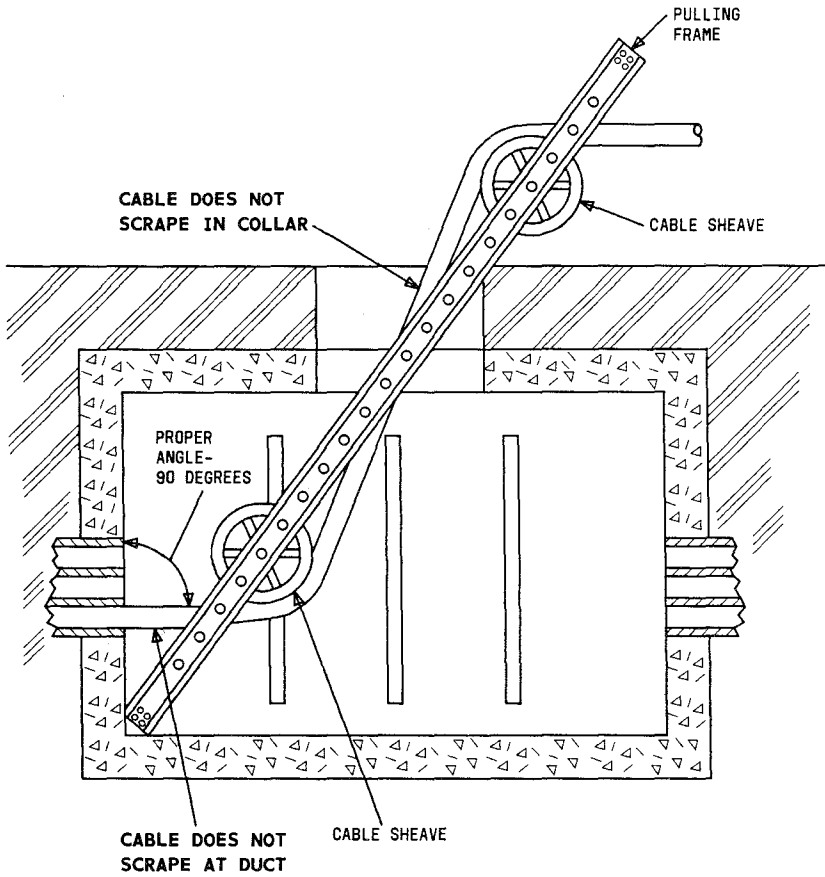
Proper Equipment Alignment Using Pulling Frame
